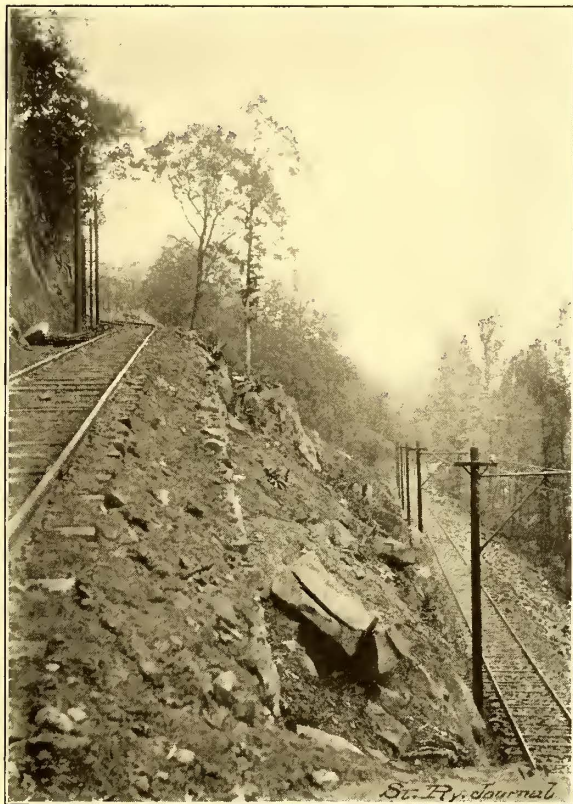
BOTH CUTS OF SIDE HILL CONSTRUCTION.
